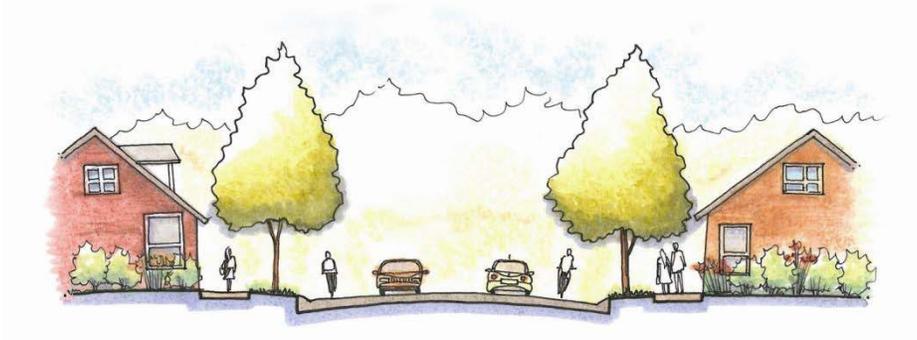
E: Typical cross-section of an urban development arterial street without parking
